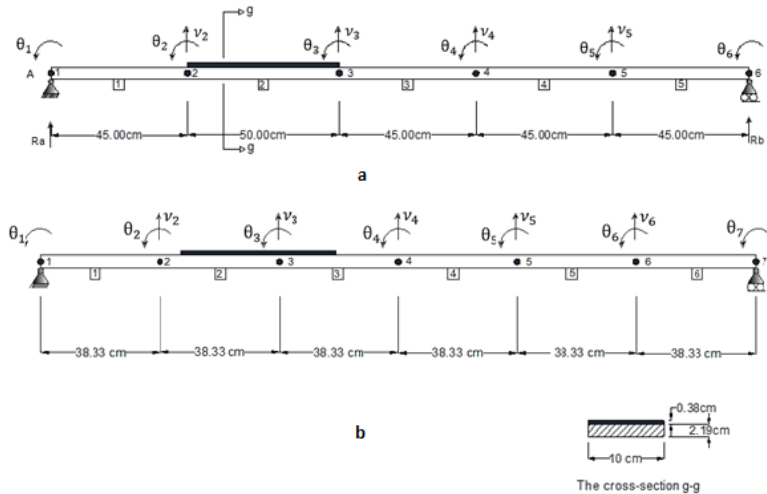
Damage model steel beam A-B shown the DOF's, (a) 5-element test beam, (b) 6-element test
